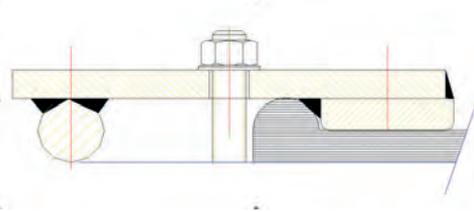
Conventional omega clamping system with bolts outside the flange of the seal.
